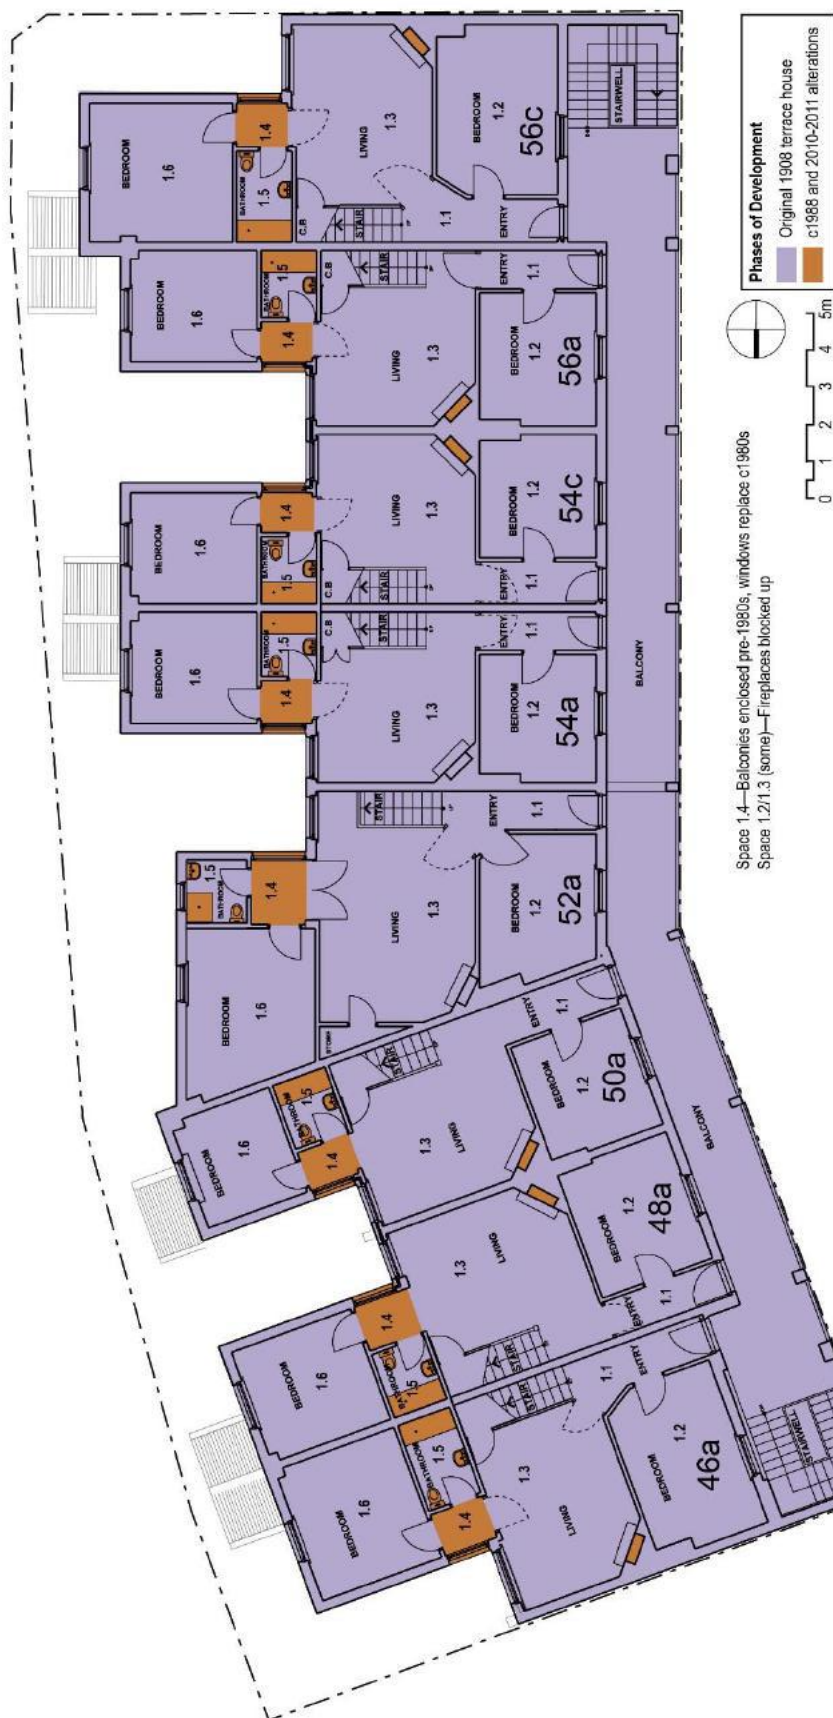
Diagram showing periods of construction—first floor plan (upper flats). (Source: LAHC, with GML overlay 2016)
